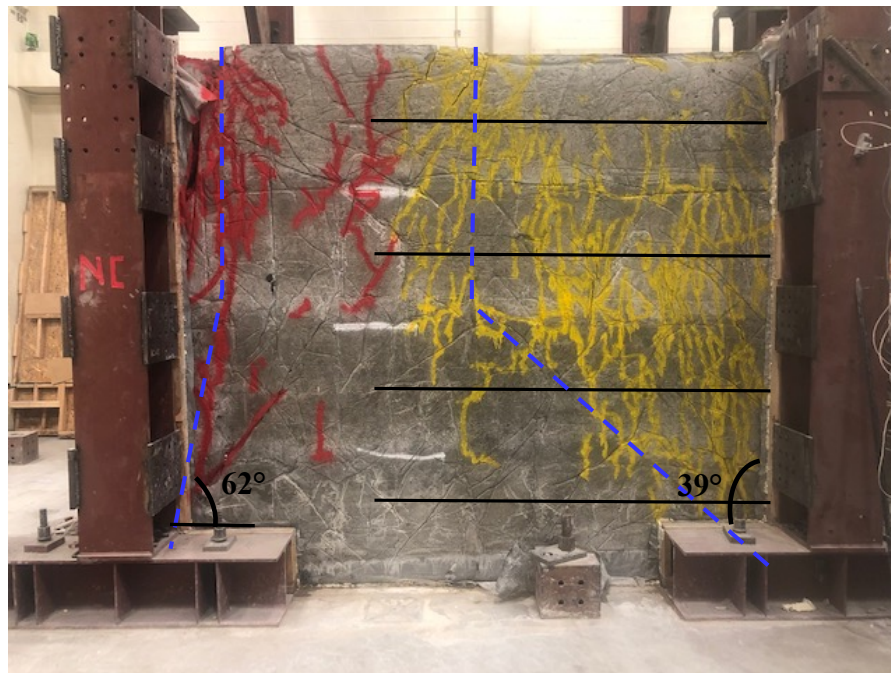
Photo showing the yellow crack patterns adjacent to the MSE wall with the six-foot wide surcharge load at the surface. Red crack patterns are for a second test with four-foot wide surcharge adjacent to free-face without MSE wall. Reinforcement locations are shown by horizontal black lines.
